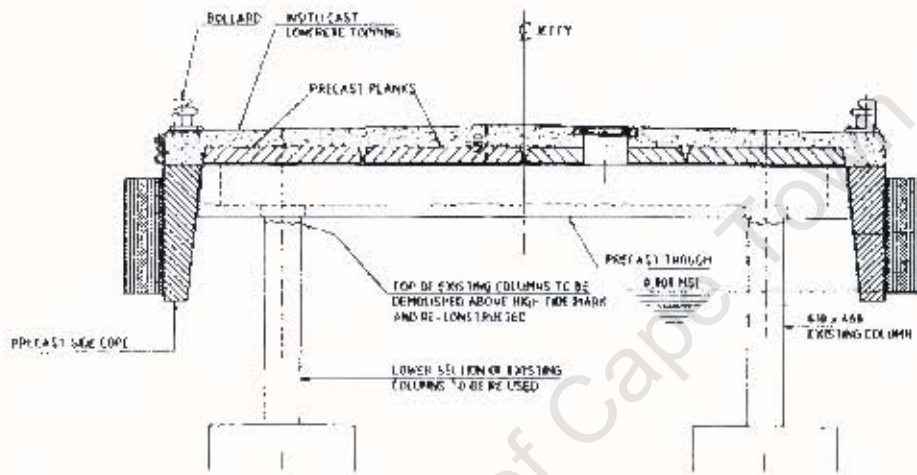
Concrete Repairs at St Helena Bay, Jetty 1
